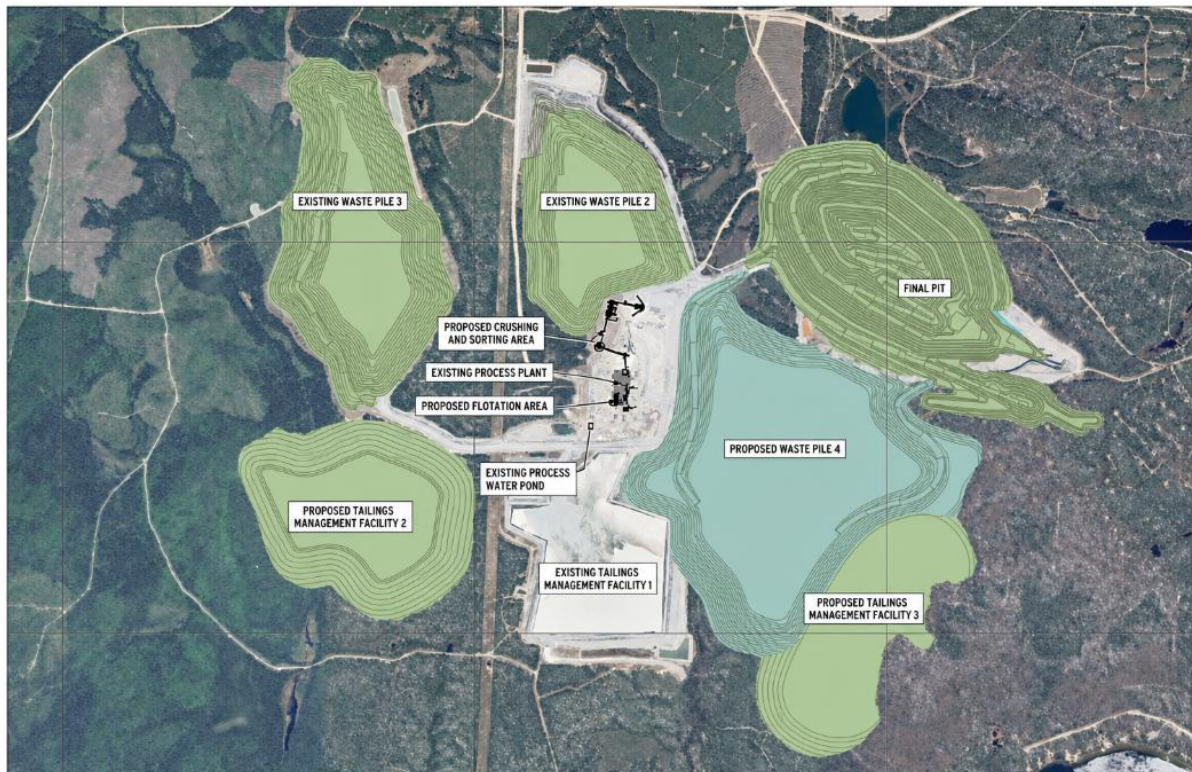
Plan view – Preliminary Tailings Storage Facility Locations
